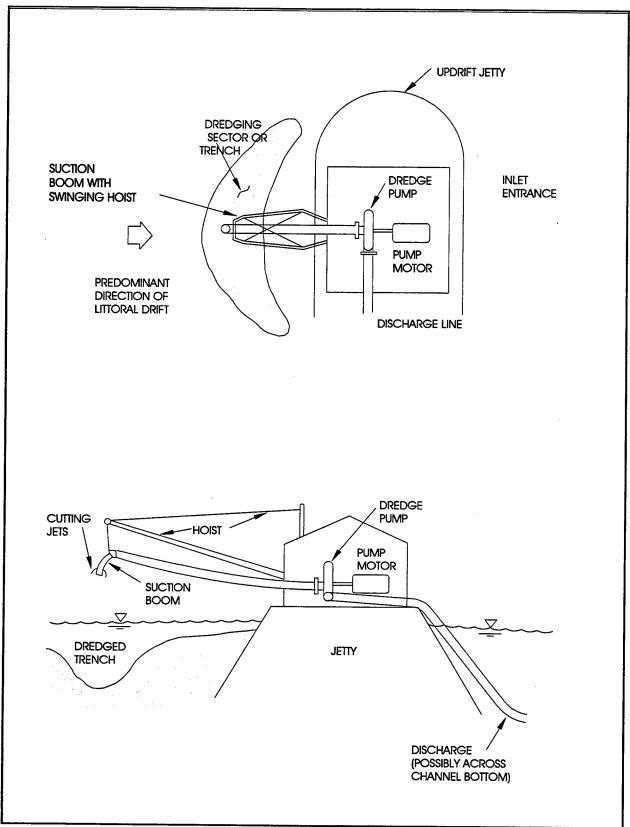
Fixed plant bypass system with pump house located on updrift jetty (HQUSACE 1991)
